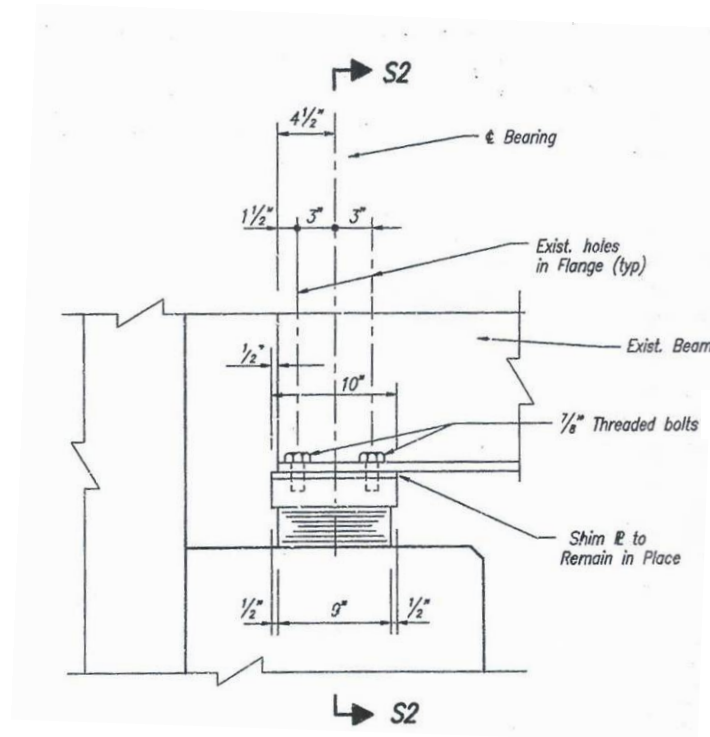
Indiana DOT's bearing assembly for elevating a bridge
